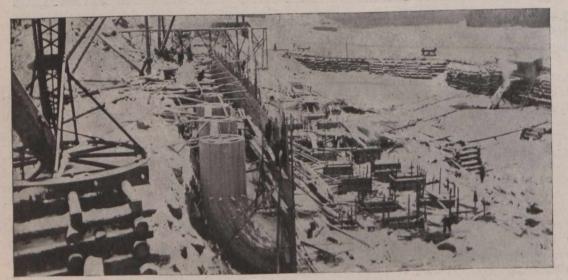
Power House Construction, Showing Draft Tube and Pier Forms and Cofferdam, Looking North.
